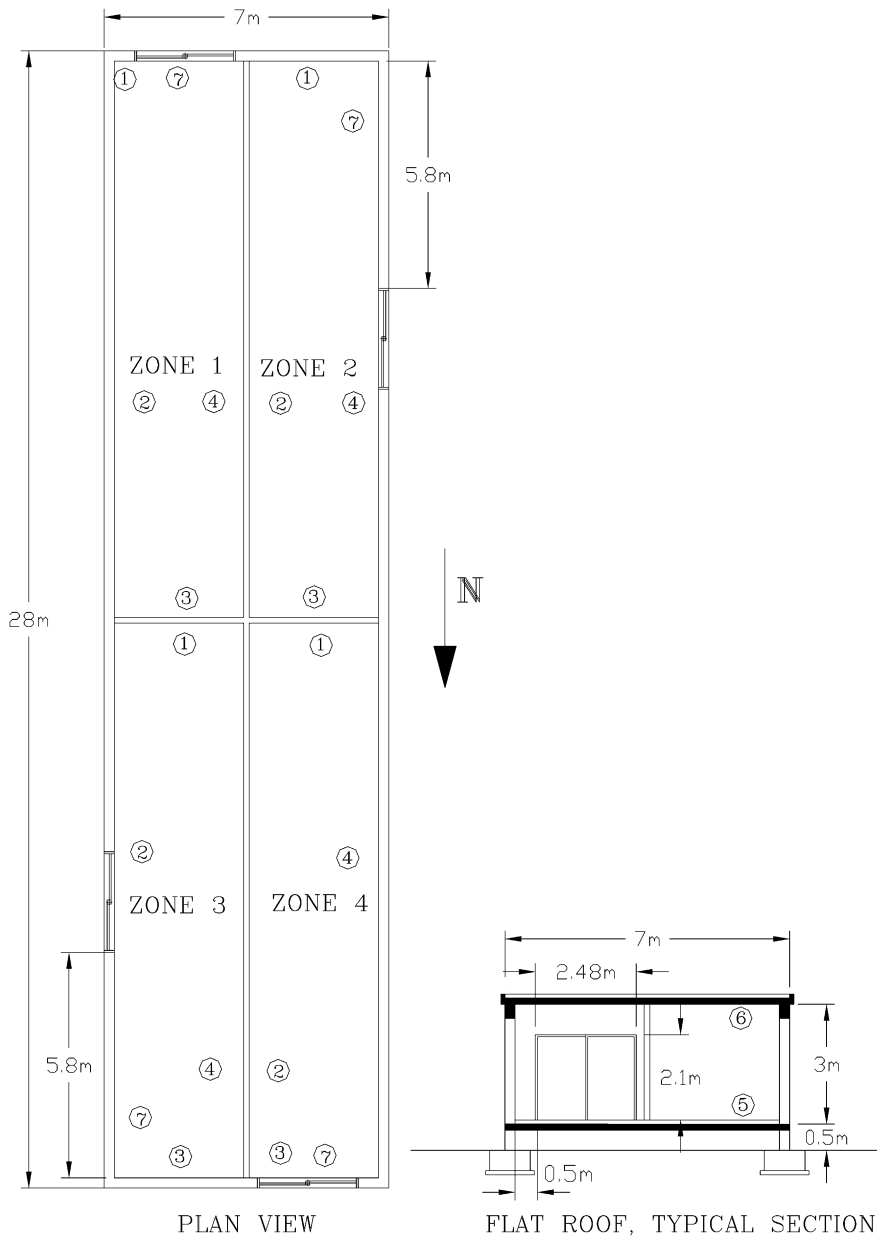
Model house Shape 2, with glass doors and changed dimensions but with the same floor area and volume.
